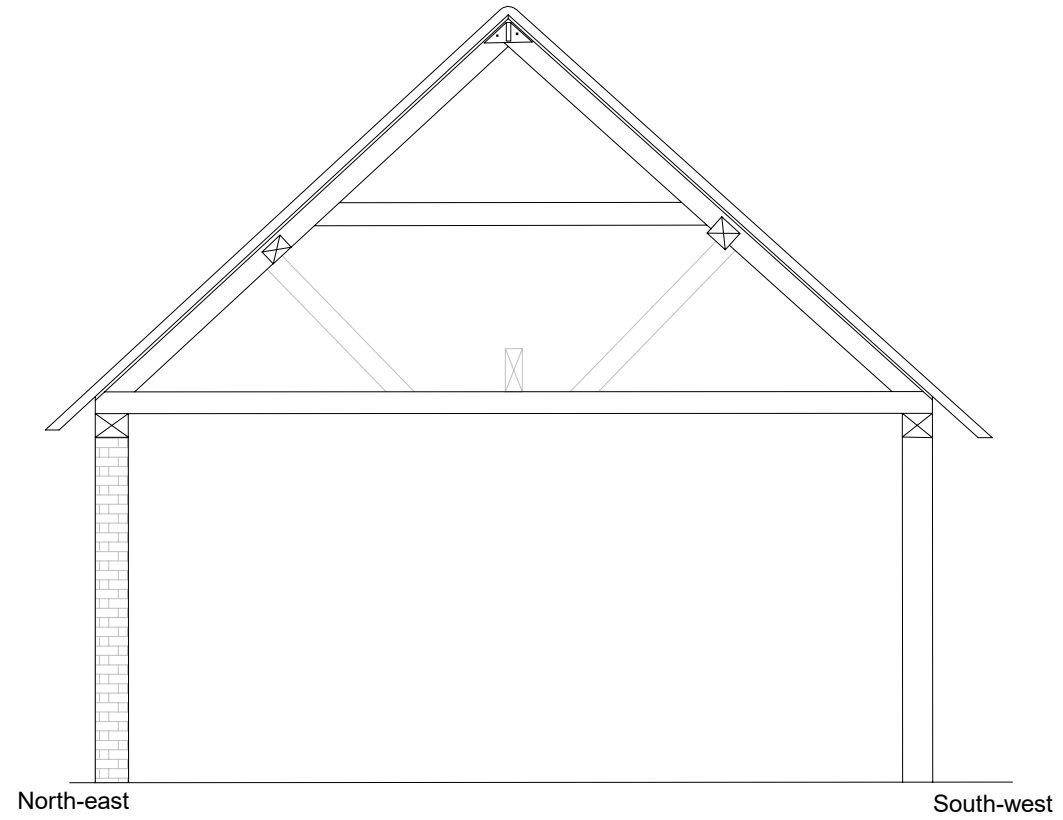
Coach house truss cross-section. Modern timbers in grey.
